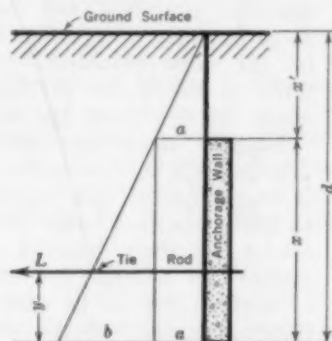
AN ANCHORAGE DESIGNED AS A CONTINUOUS WALL
